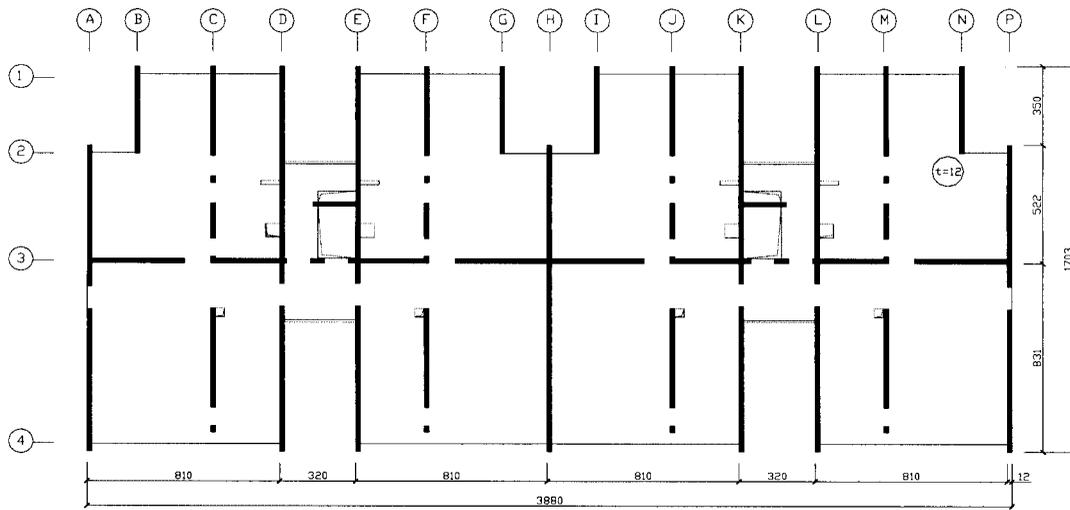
Typical plan view for a rectangular case (Plan No. 3).
